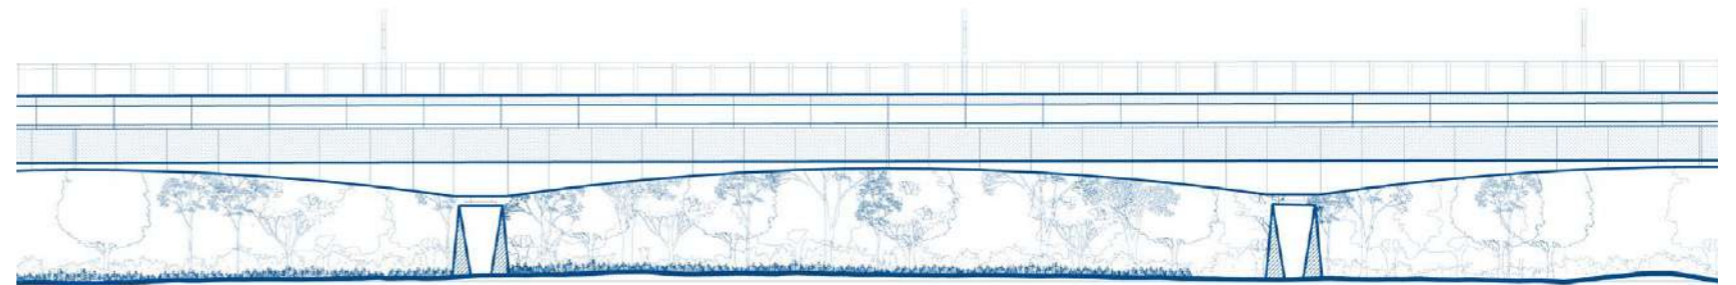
\_ Proposed elevation - Typical 1.65m opaque barrier
